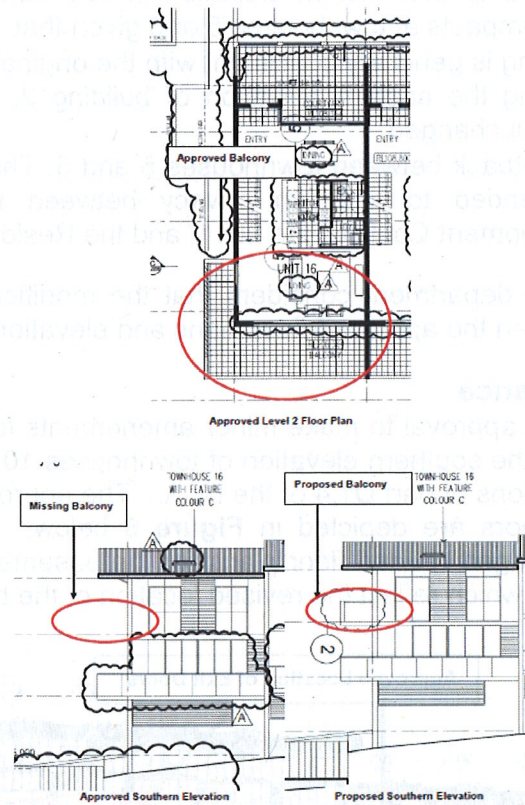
Proposed Revisions to the Southern Elevation to Correct Drawing Errors
